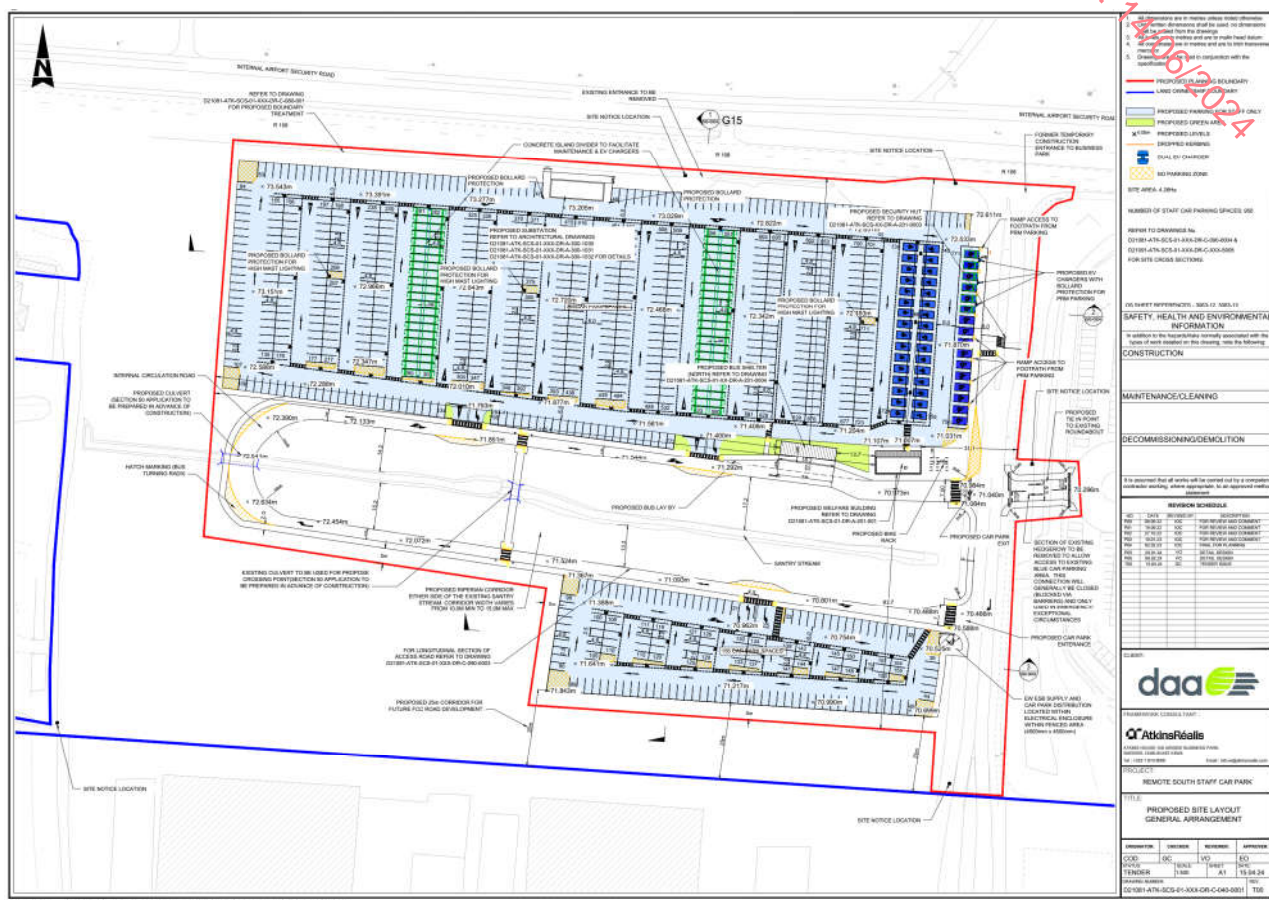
Proposed Site Layout Plan for Remote South Staff Car Park
